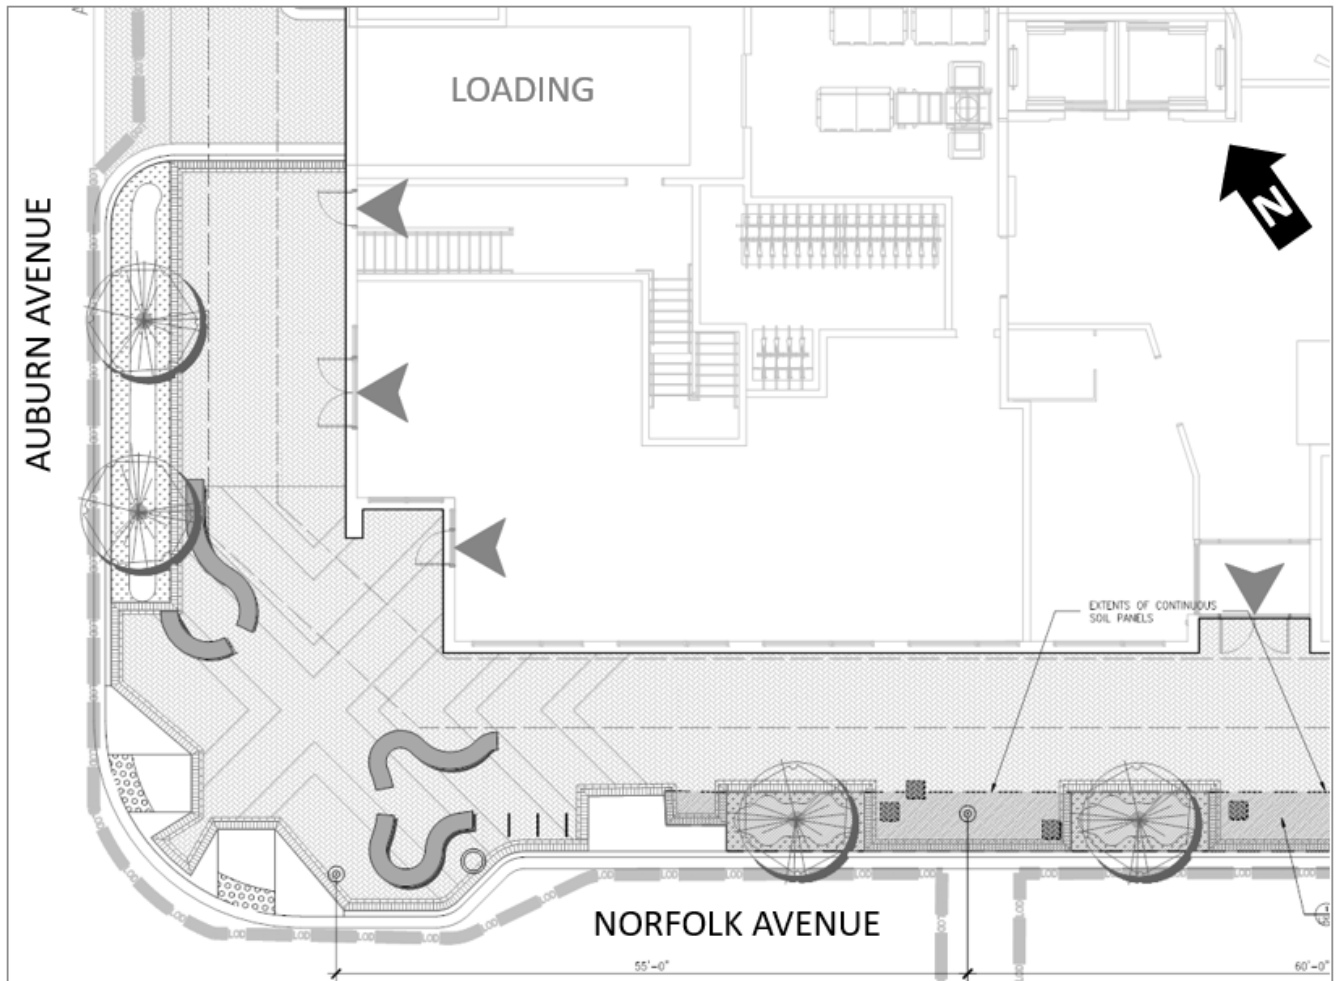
Enhanced Streetscape corner at Norfolk Avenue and Auburn Avenue
